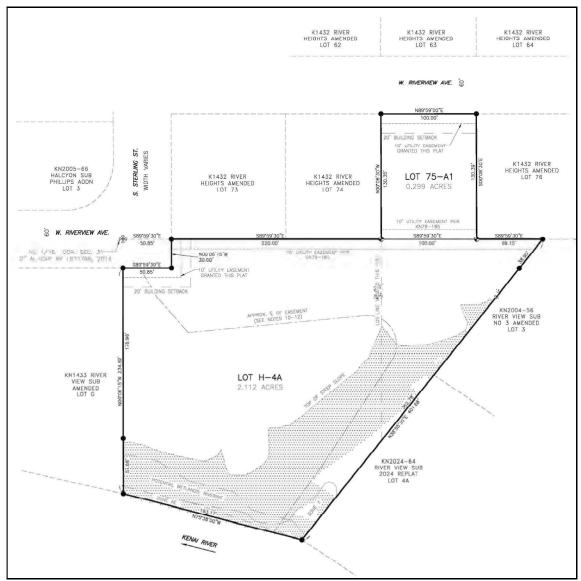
Sholin Subdivision 2025 Replat shows a lot line adjustment.
